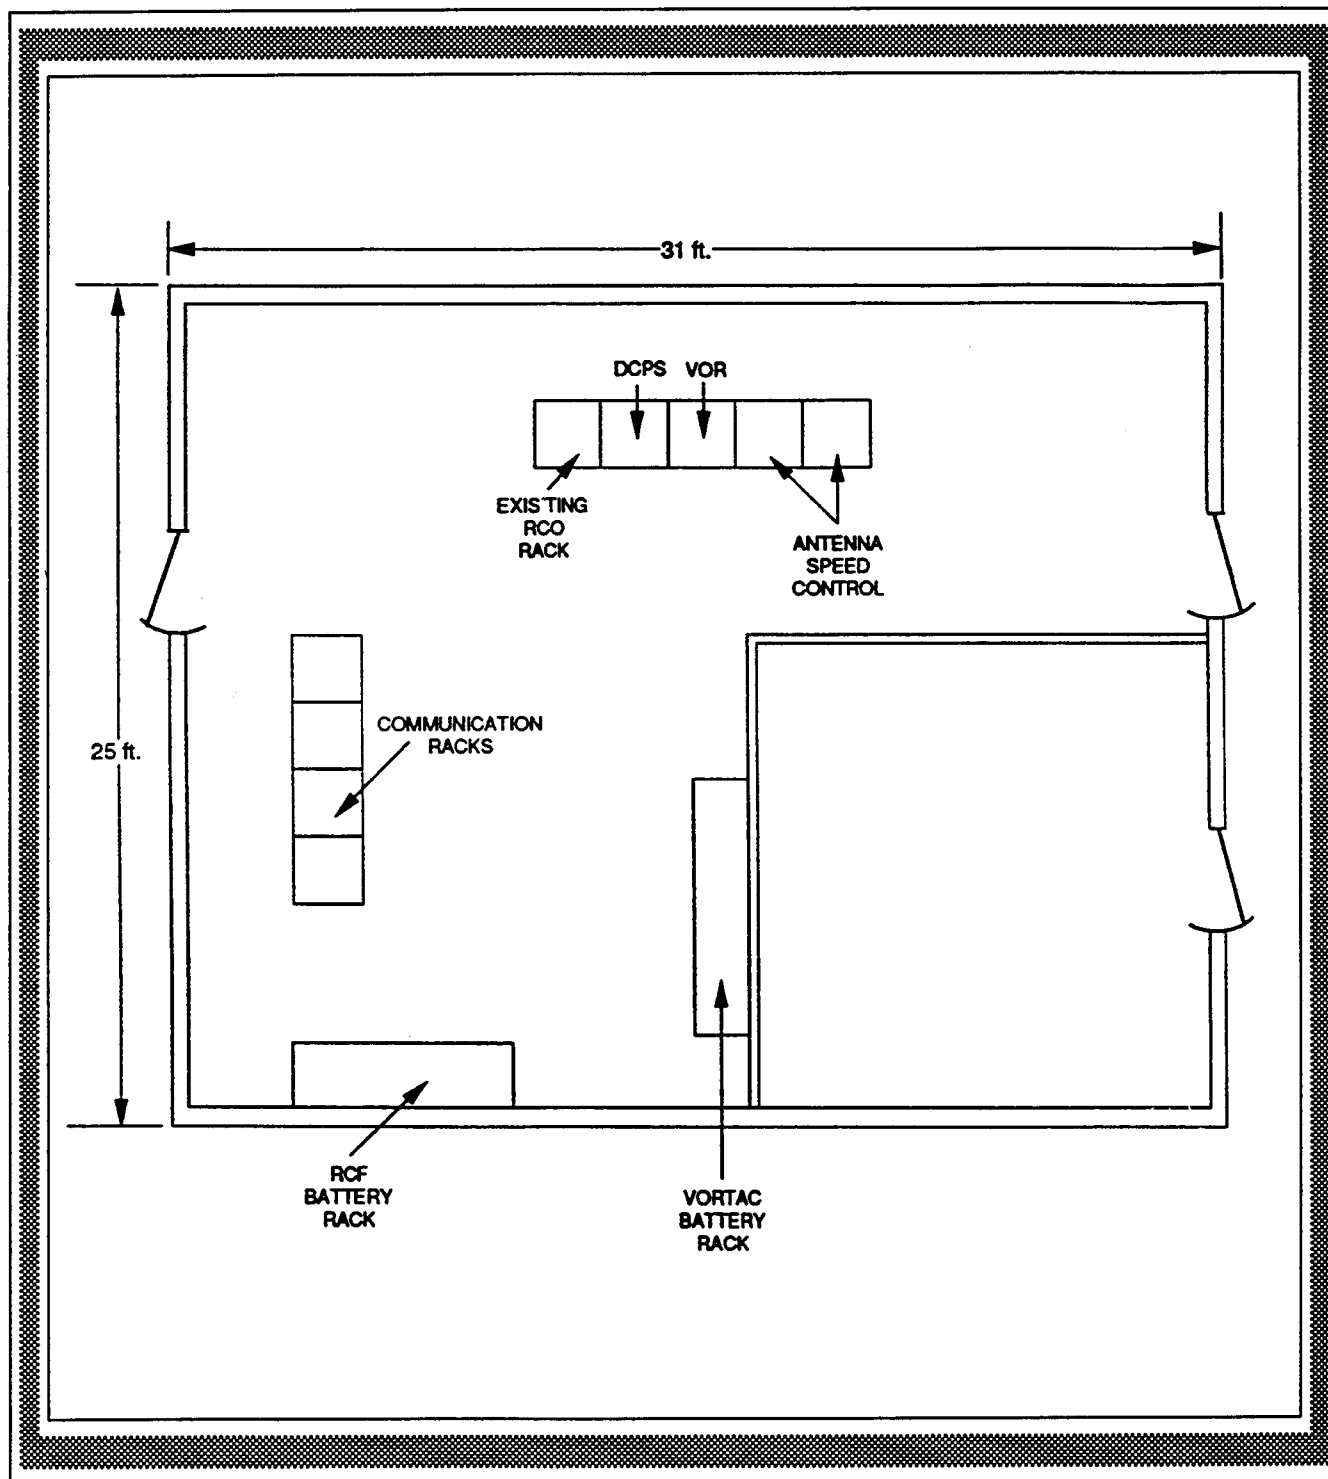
RCF/VORTAC COLLOCATED IN A 25'x 31' BUILDING
